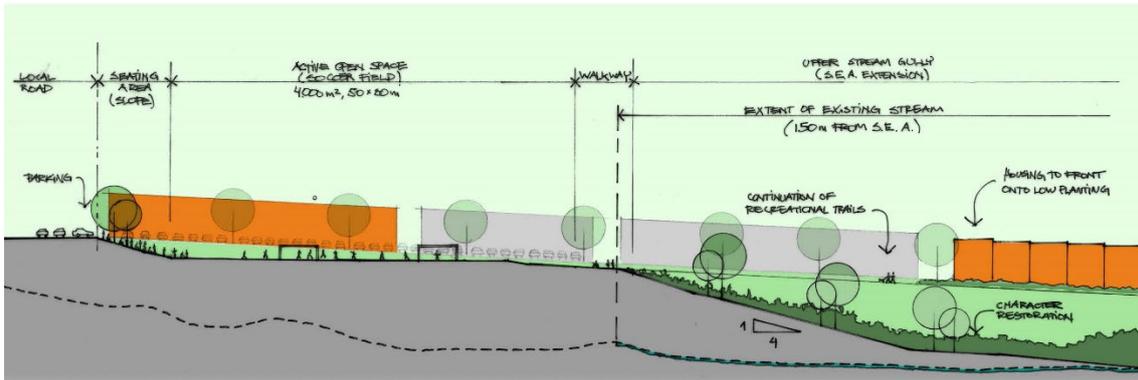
Open space cross section, showing flat active open space and SEA extension (1:4 slope) surrounded by apartments (grey) and terraces (orange).
